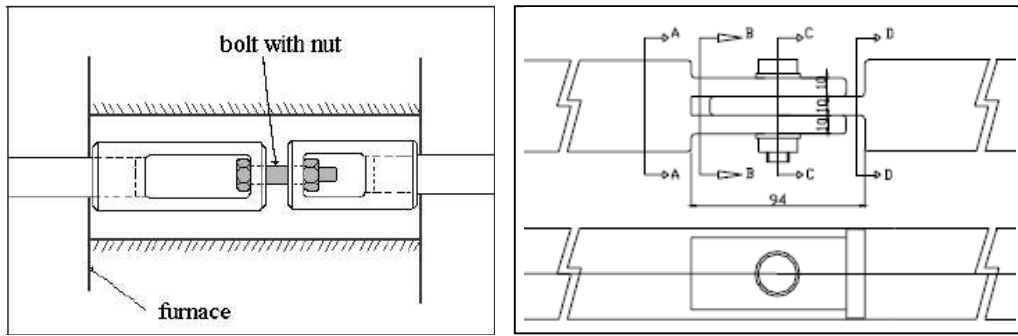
Test set-ups for tensile and shear tests performed on bolts
